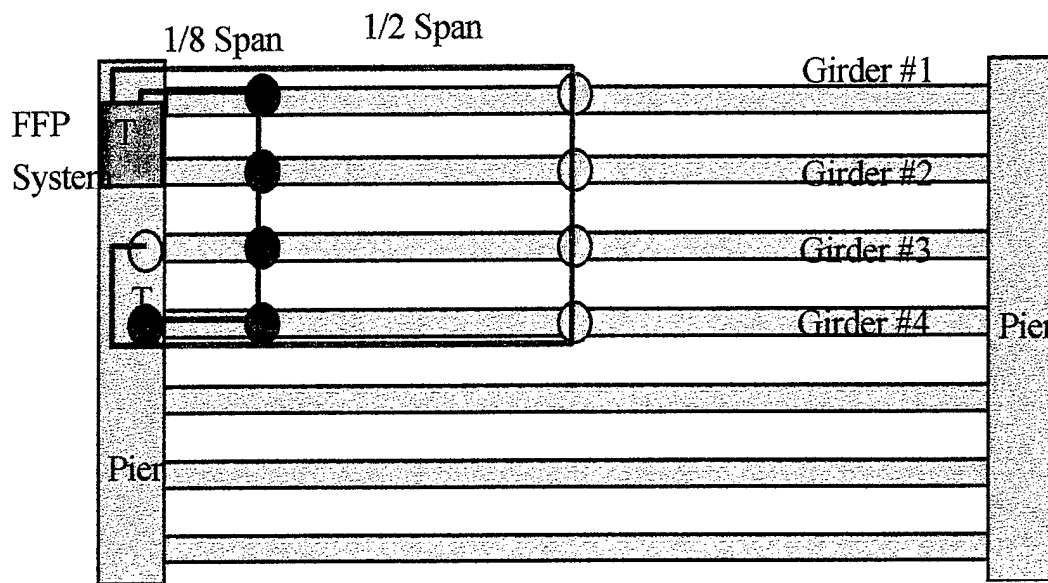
A schematic of the arrangement of FBG sensors on the girders as it would look from above this bridge. Sensors were attached at 1/8-span, 1-2 span and the pier. FBG sensors were only placed on girders 1 to 4. Traffic direction is from left to right in the above schematic.
